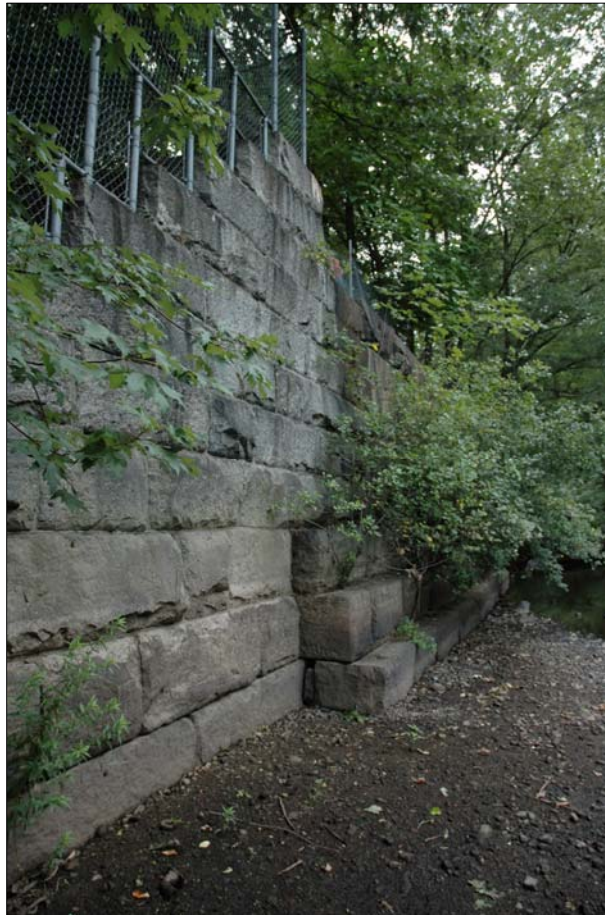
Resource 29, Assabet River Bridge, north abutment, looking east.
